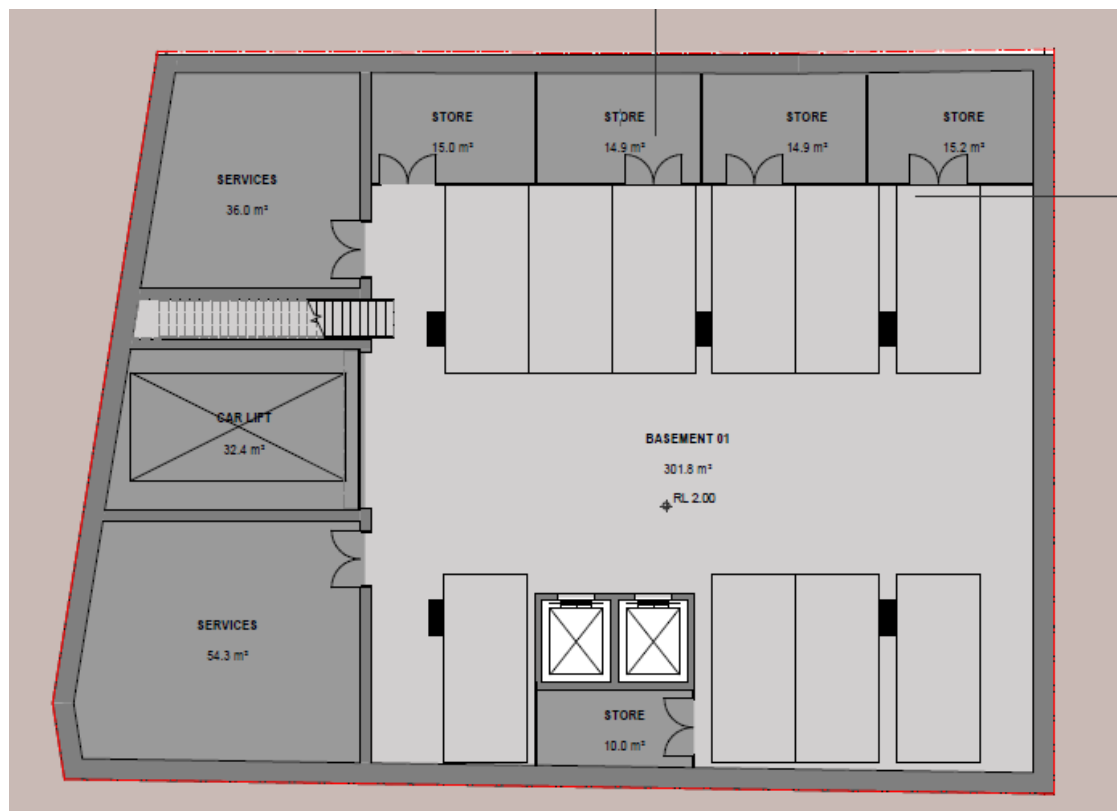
Basement plan for the proposed development. The basement floorplan matches the existing floorplan, encompassing the entirety of the study area. *Source:* Rose Property Group.
